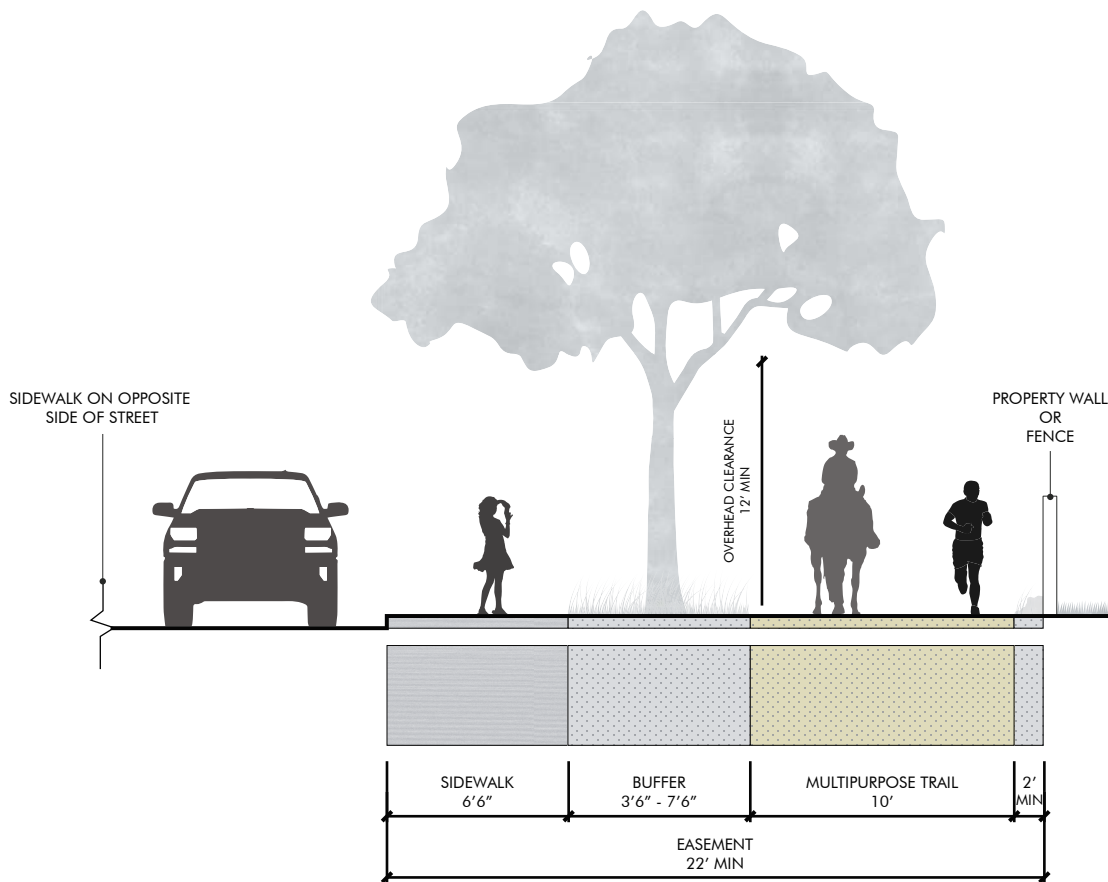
TYPICAL SECTION: URBAN (TRAIL WITH CLASS I)
